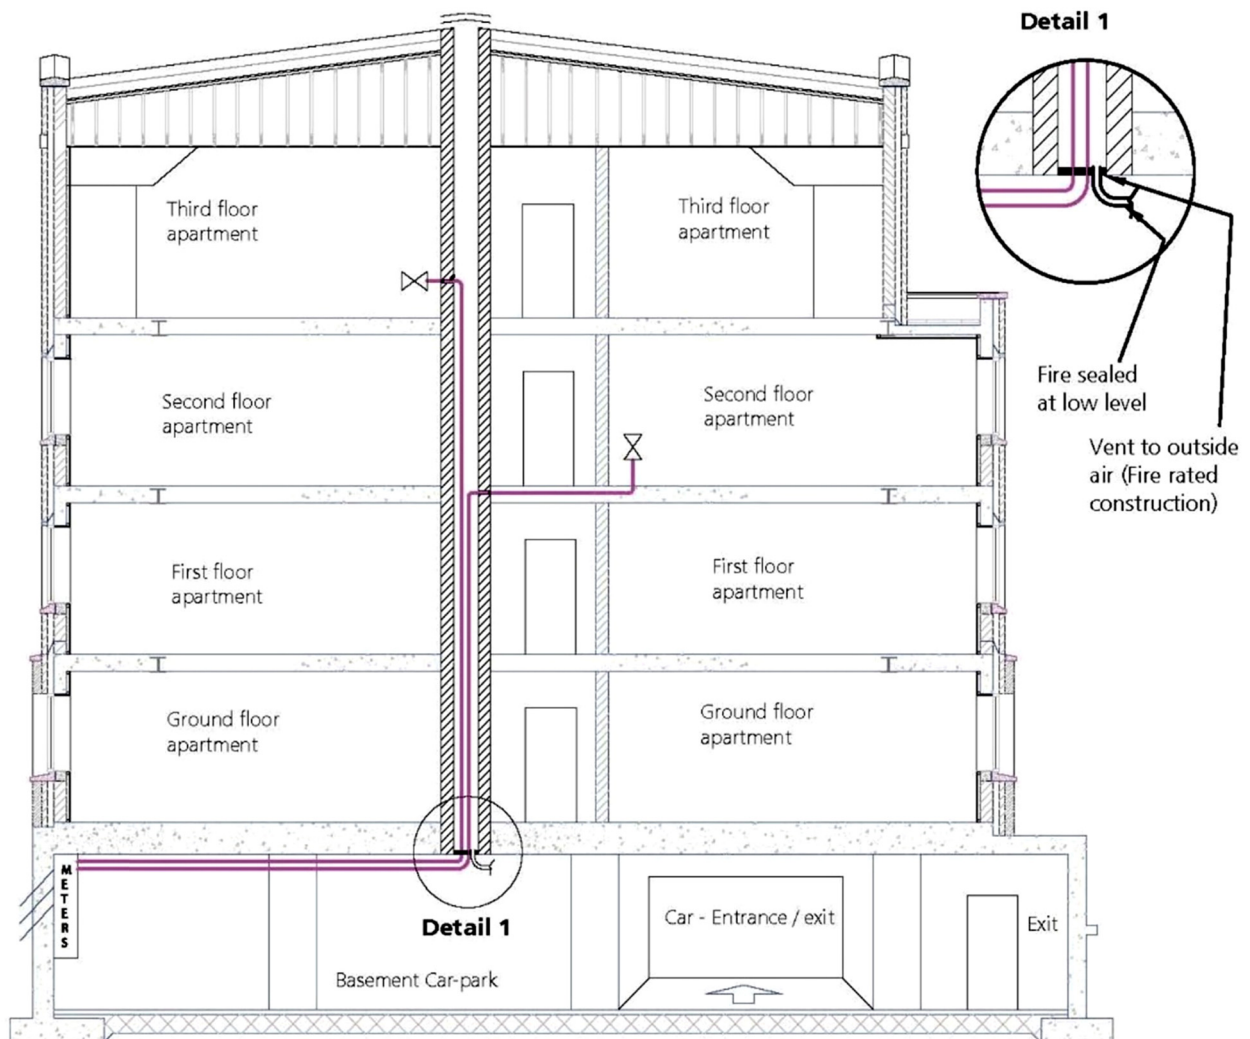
Placing the main pipe in the center of the building (Guevara [10]).
